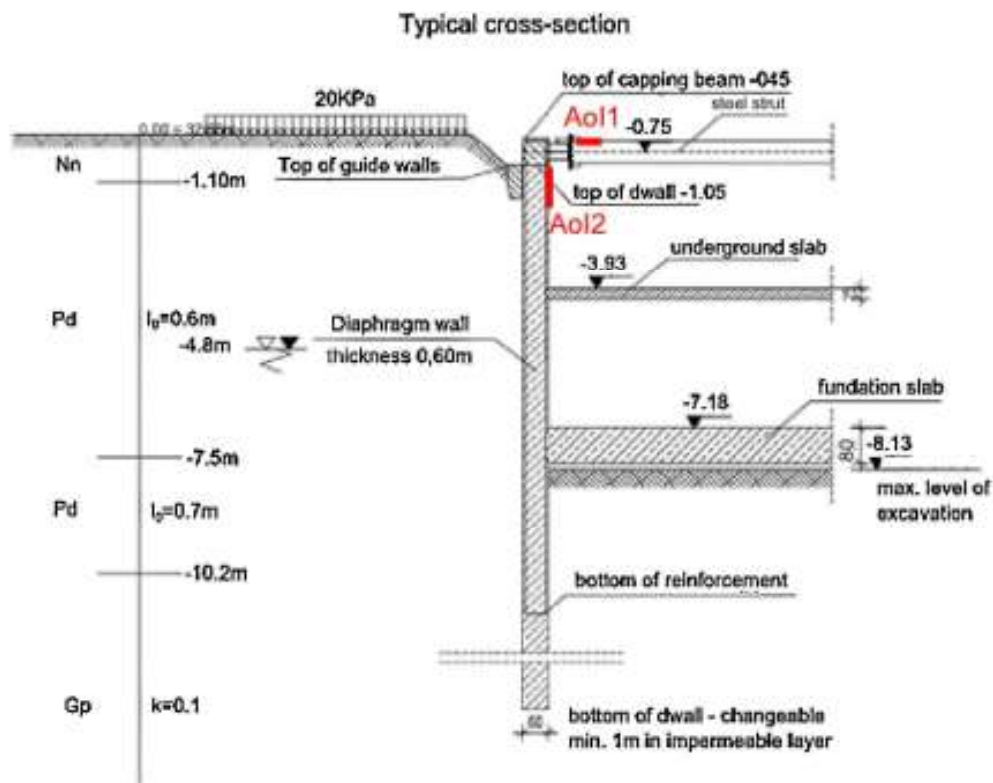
Typical cross-section of strutted diaphragm wall with marked localizations of the areas of interest (AOIs).
